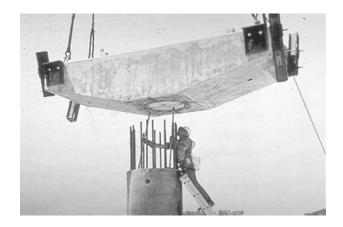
Threading of Precast Cross Head over Extended Column Bars on Getty People-Mover Guideway [1.26]
